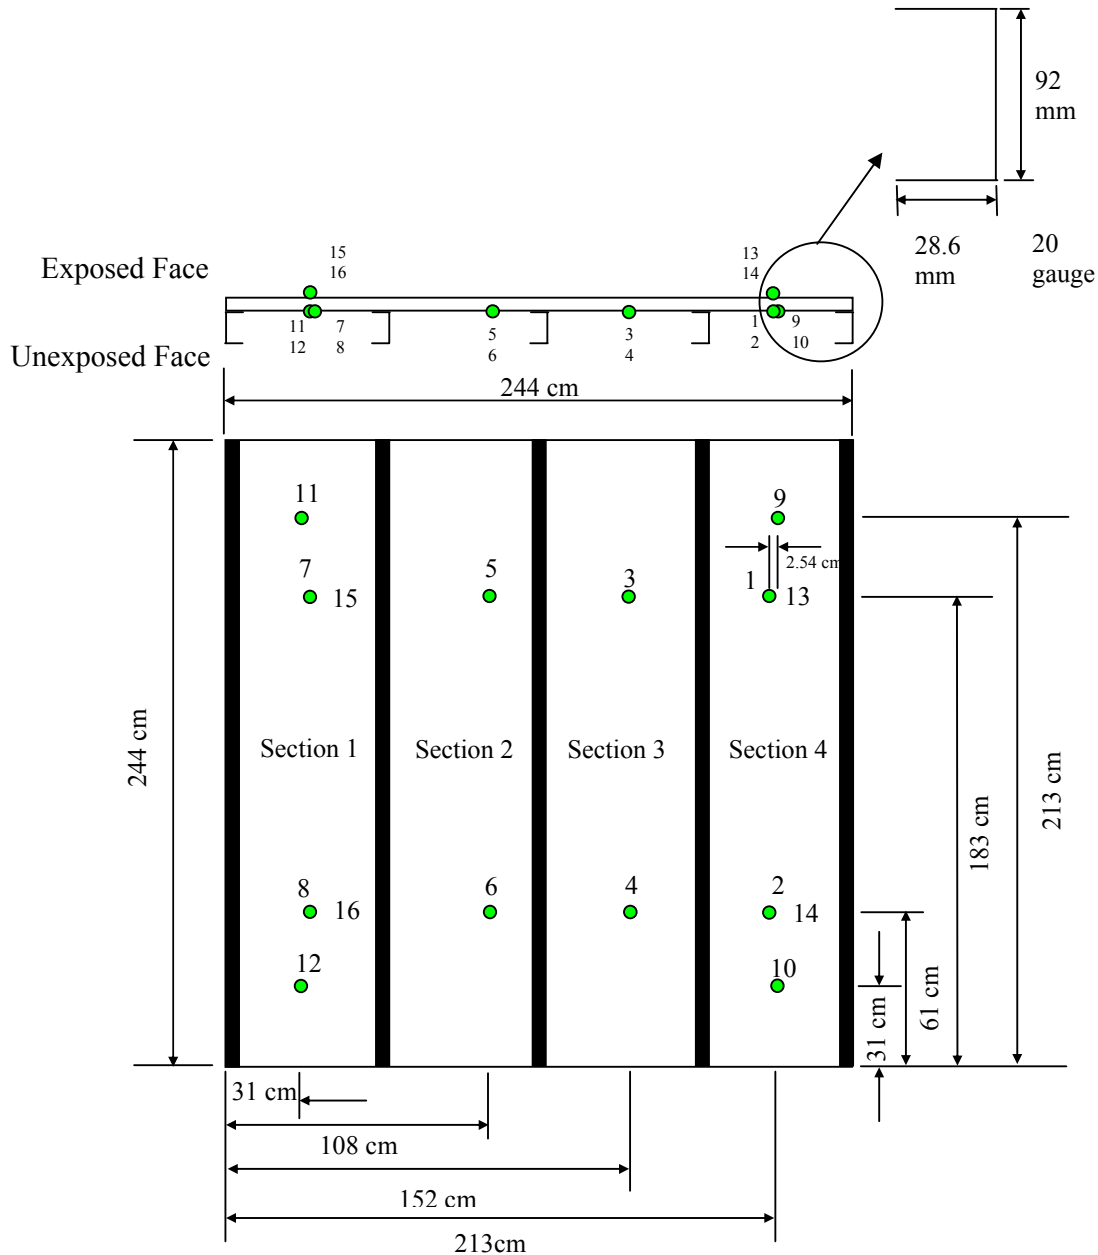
Drawing of Assembly One and Assembly Two, showing the location of the unexposed face temperature measurements.
